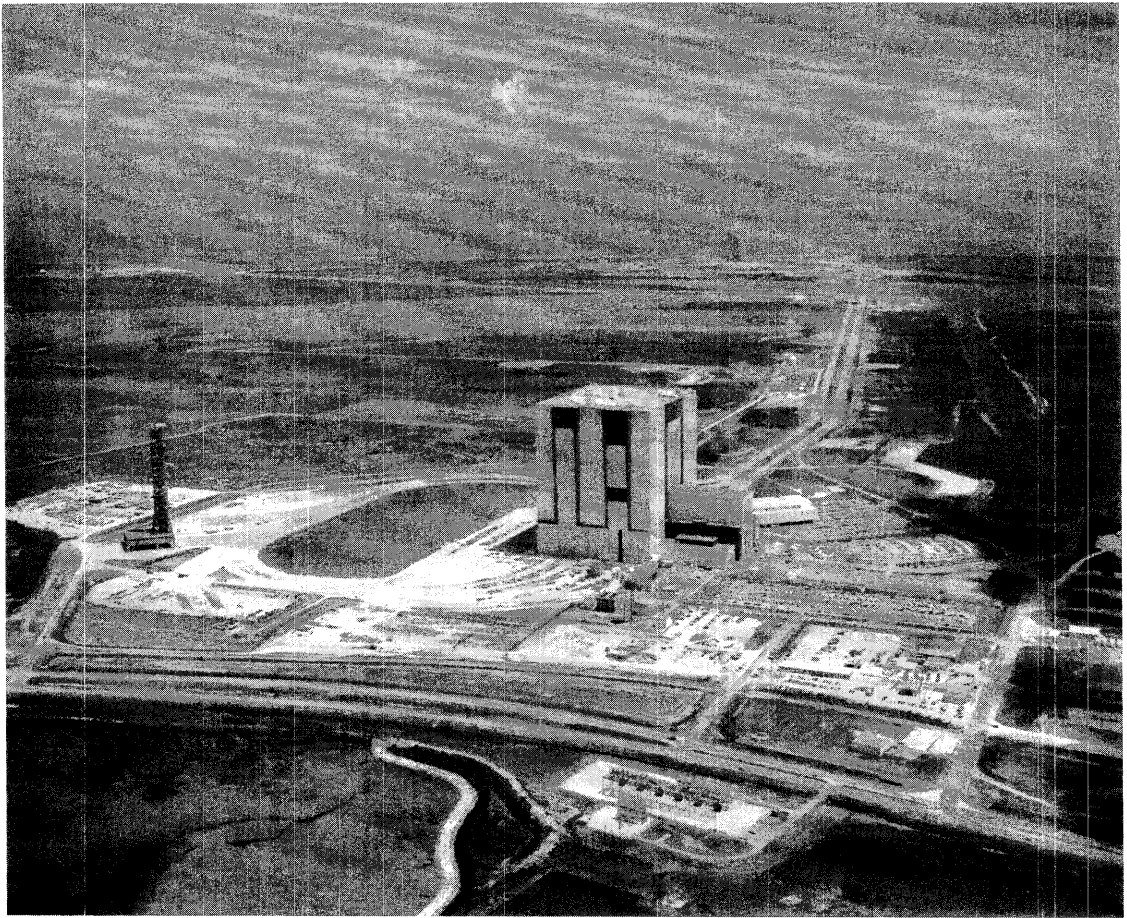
Heavy construction project—Kennedy Space Center launch complex. (U.S. Air Force photograph)
